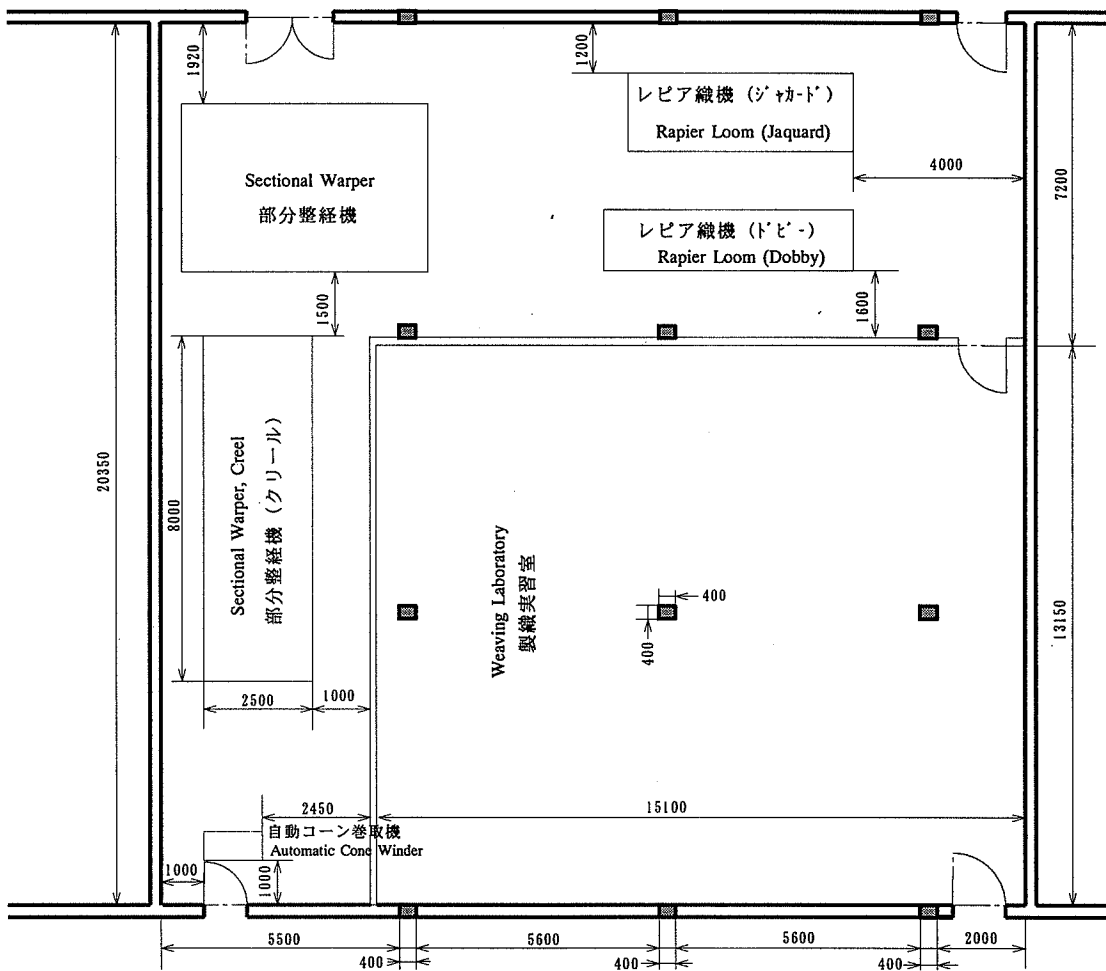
Layout Plan (6) Weaving Laboratory
